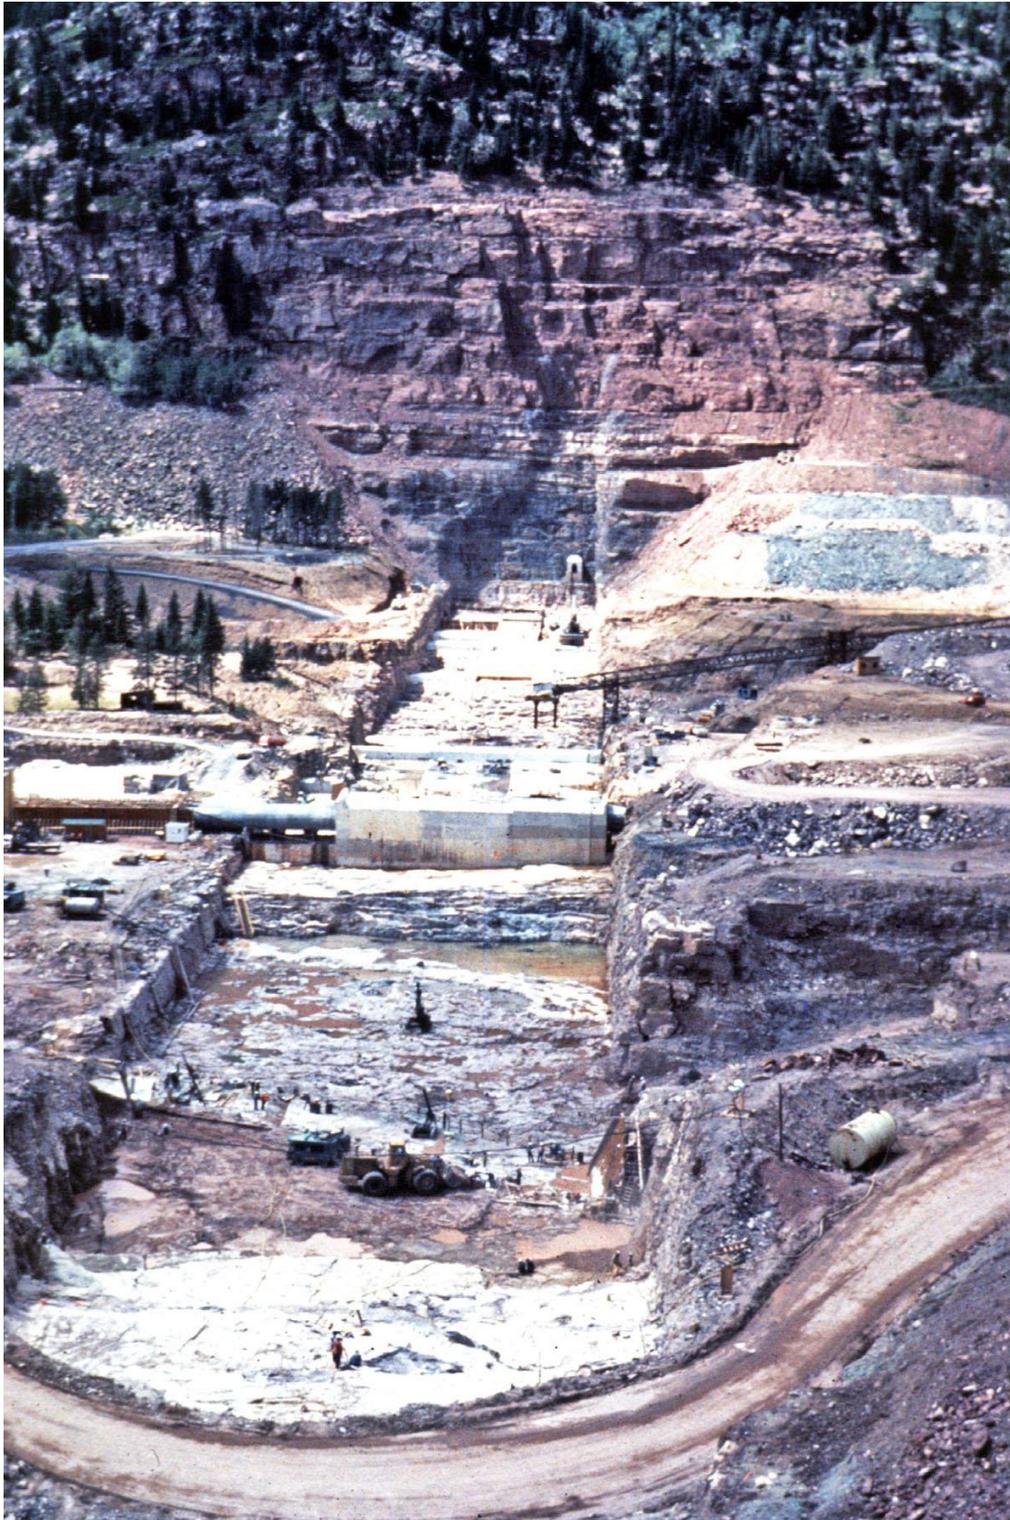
Entire footprint of a concrete gravity dam is excavated to material capable of withstanding loads imposed by the dam.
